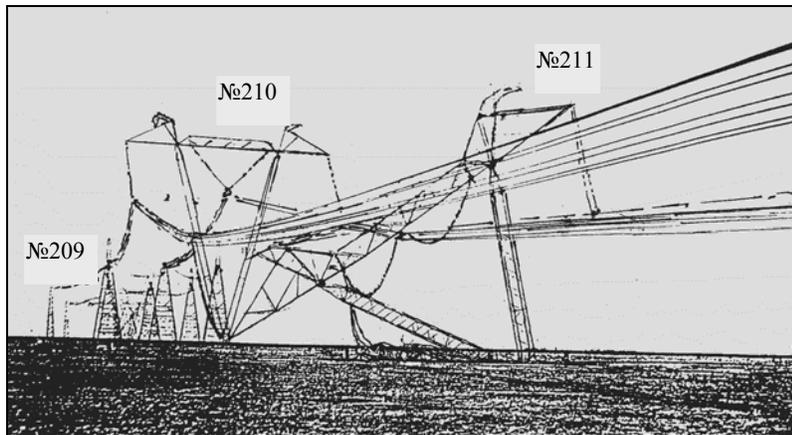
A general view of towers of anchor span №№209-213 of the 1150 kV Ekibustuz - Barnaul OHL after disruption of tower №212
